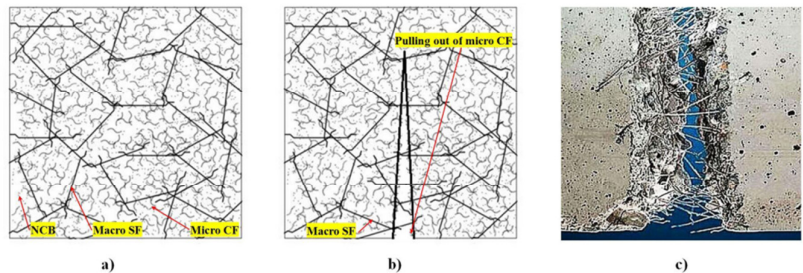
Conductive network of triphasic materials in the concrete matrix (a) before cracking, b) after cracking, (c) Macro SF cross concrete crack
